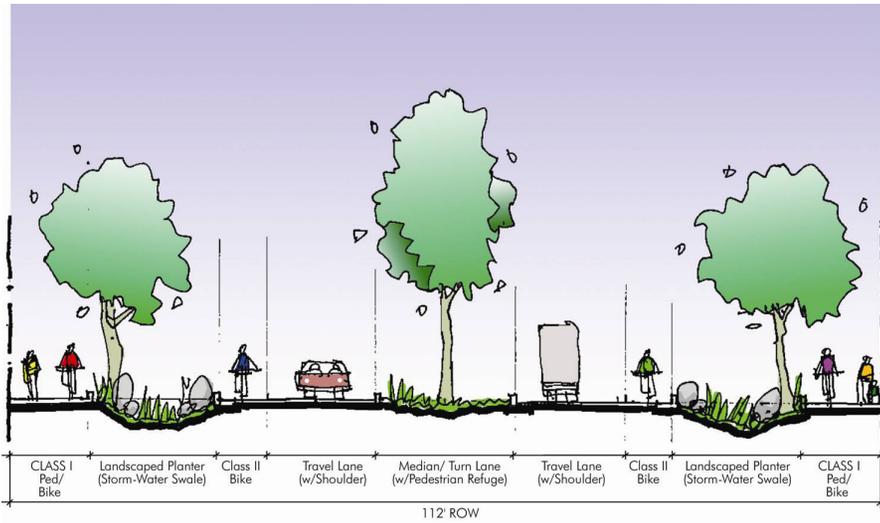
CROSS SECTION OF COMPLETE STREETS CONCEPT A (RAILROAD AVENUE TO EAST MAIN STREET)
